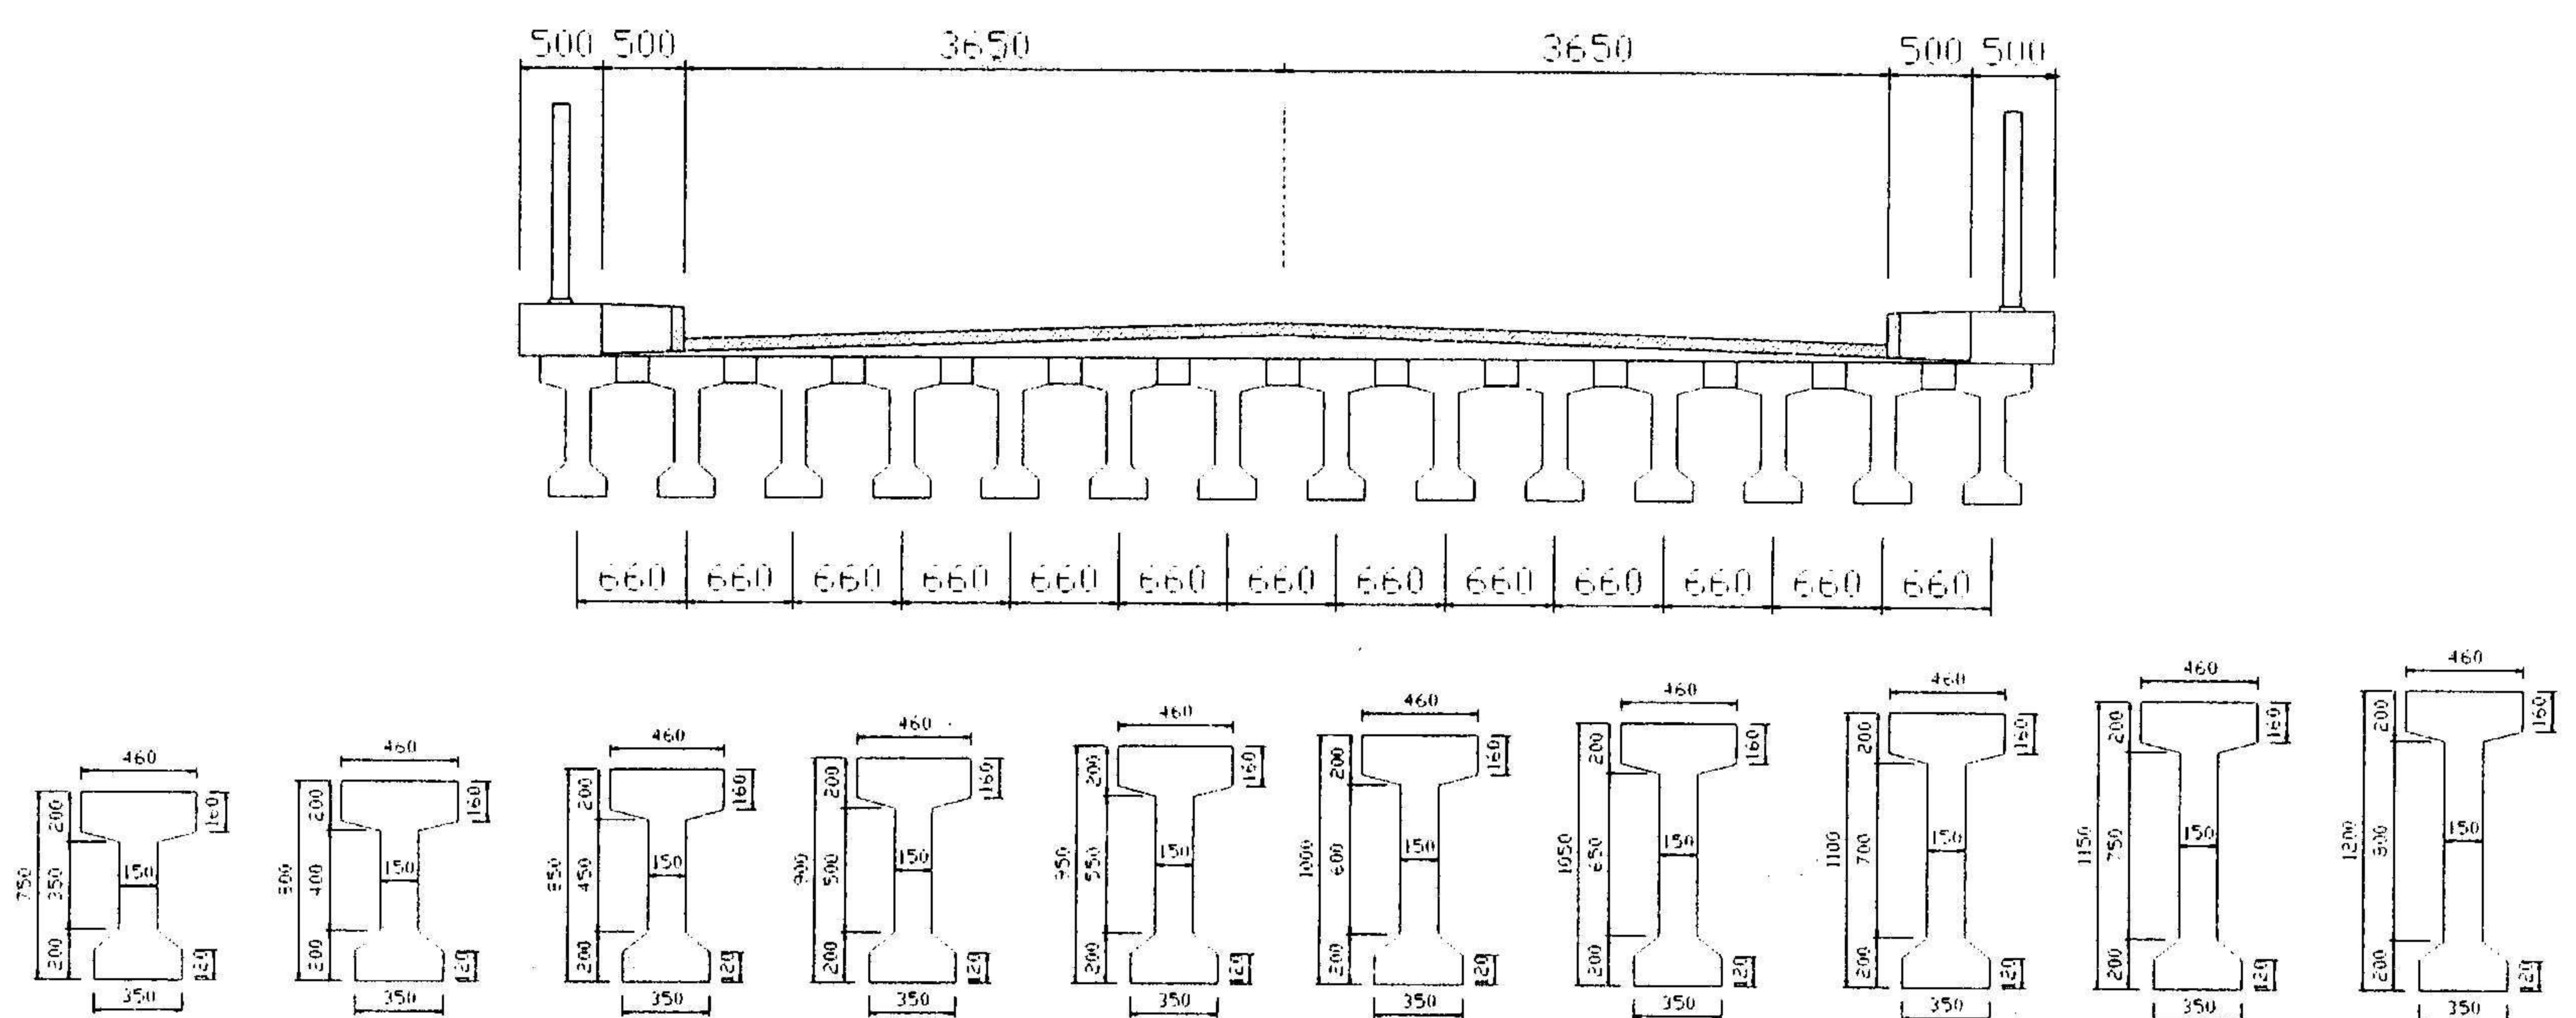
Typical two lanes girder bridge of T-shape with heavy bottom flange
